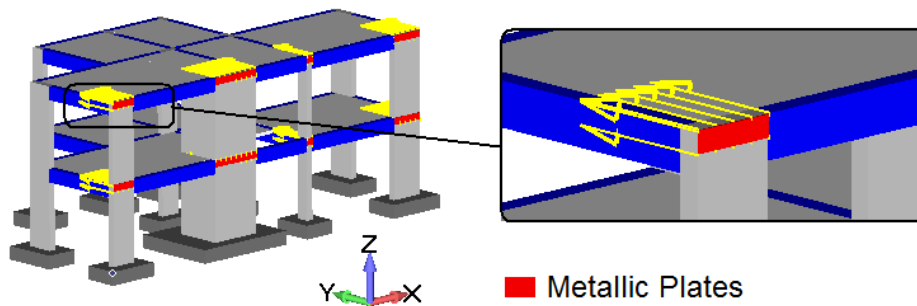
2-STOREY RC BUILDING. METALLIC PLATES FOR HORIZONTAL LOADING.
